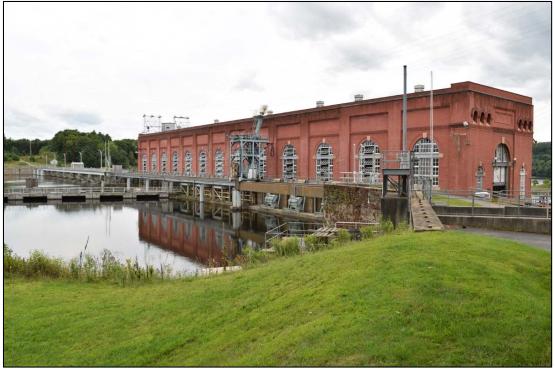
Vernon Project, Dam and Powerhouse looking southeast.
